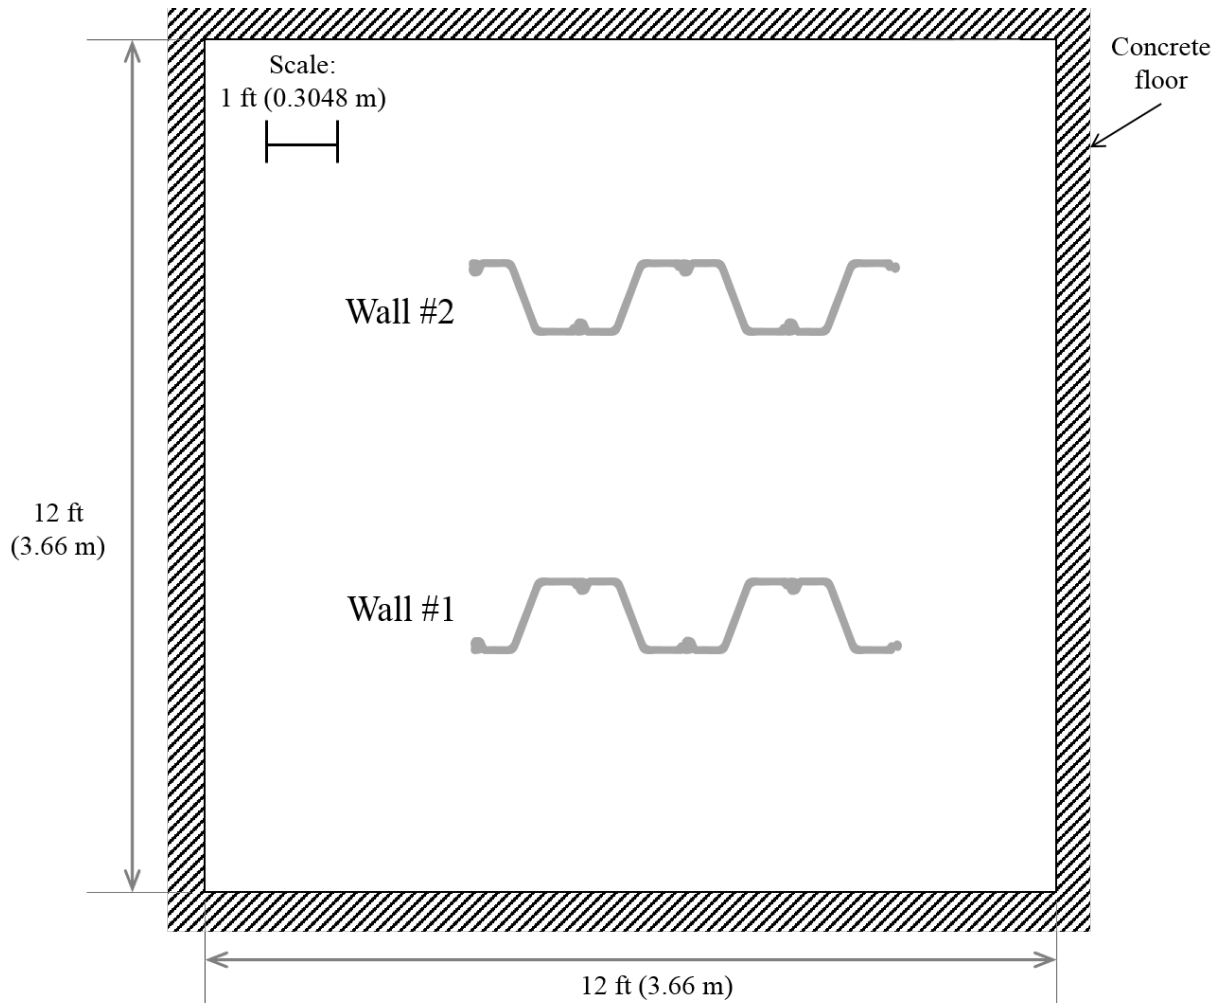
Plan view of geotechnical test pit showing locations of two sheet pile walls.
